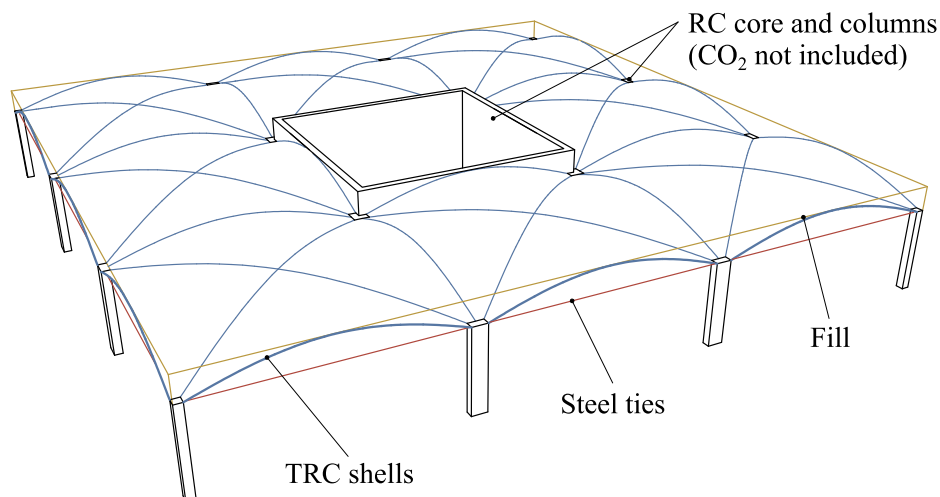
Simplified floor-plan for a tower featuring thin-shell concrete floors, showing eight identical pre-cast units spanning onto a reinforced concrete core and peripheral columns.
